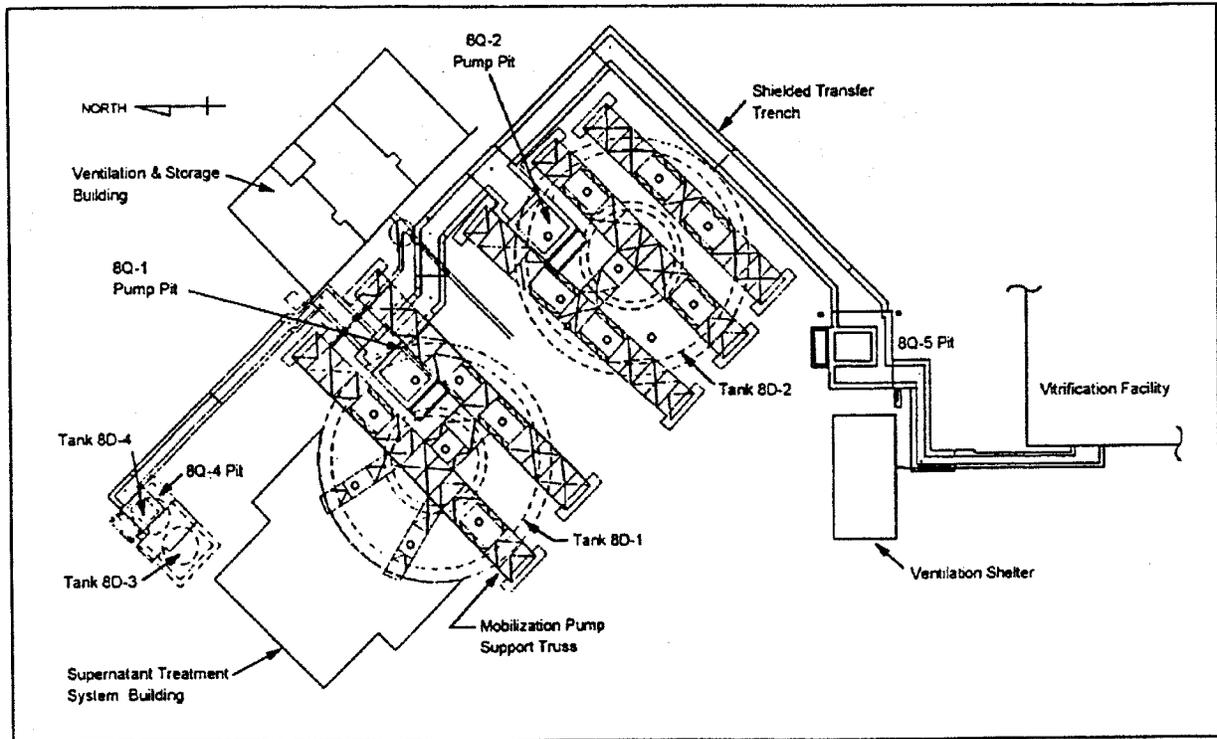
Waste Tank Farm Facilities Supporting Vitrification
